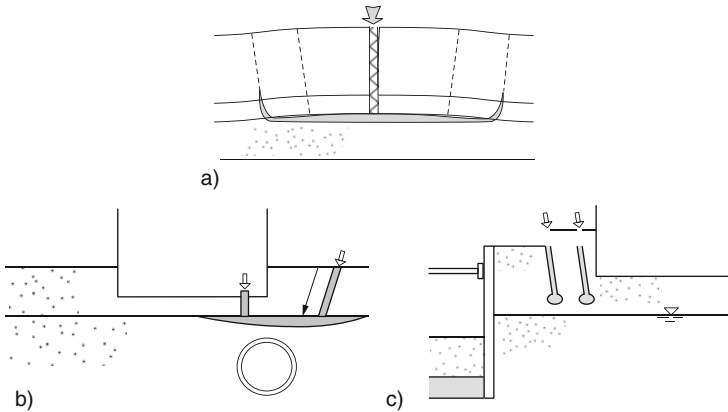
Compensation grouting: (a) heave of a layer, (b) heave above tunnel, (c) near a supported open ditch
